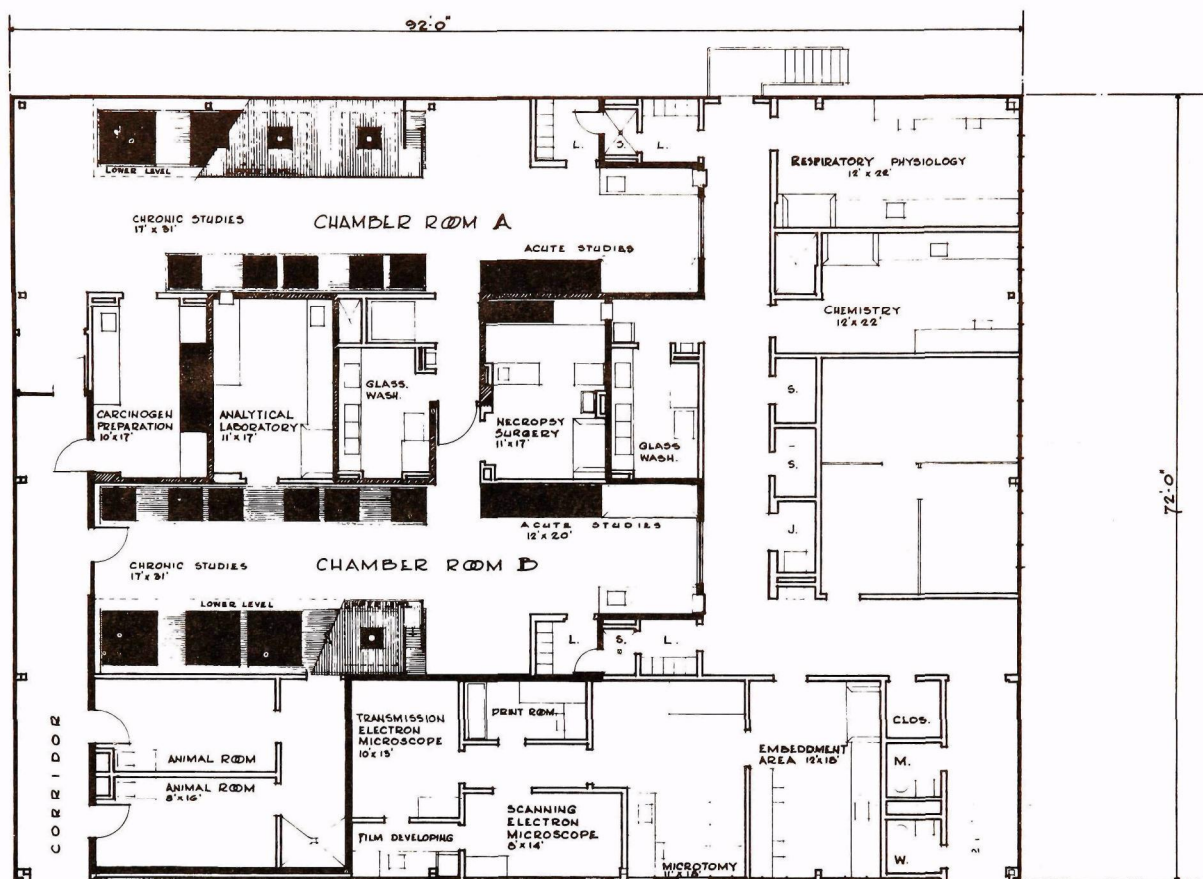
Floor plan of Brookhaven Inhalation Toxicology Facility.
